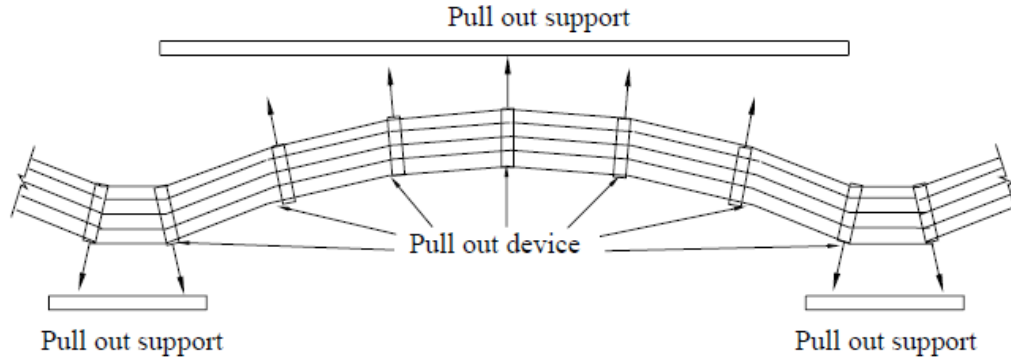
Proposed Construction Method for Curved Pre-Tensioned Concrete I-Girder Bridges
